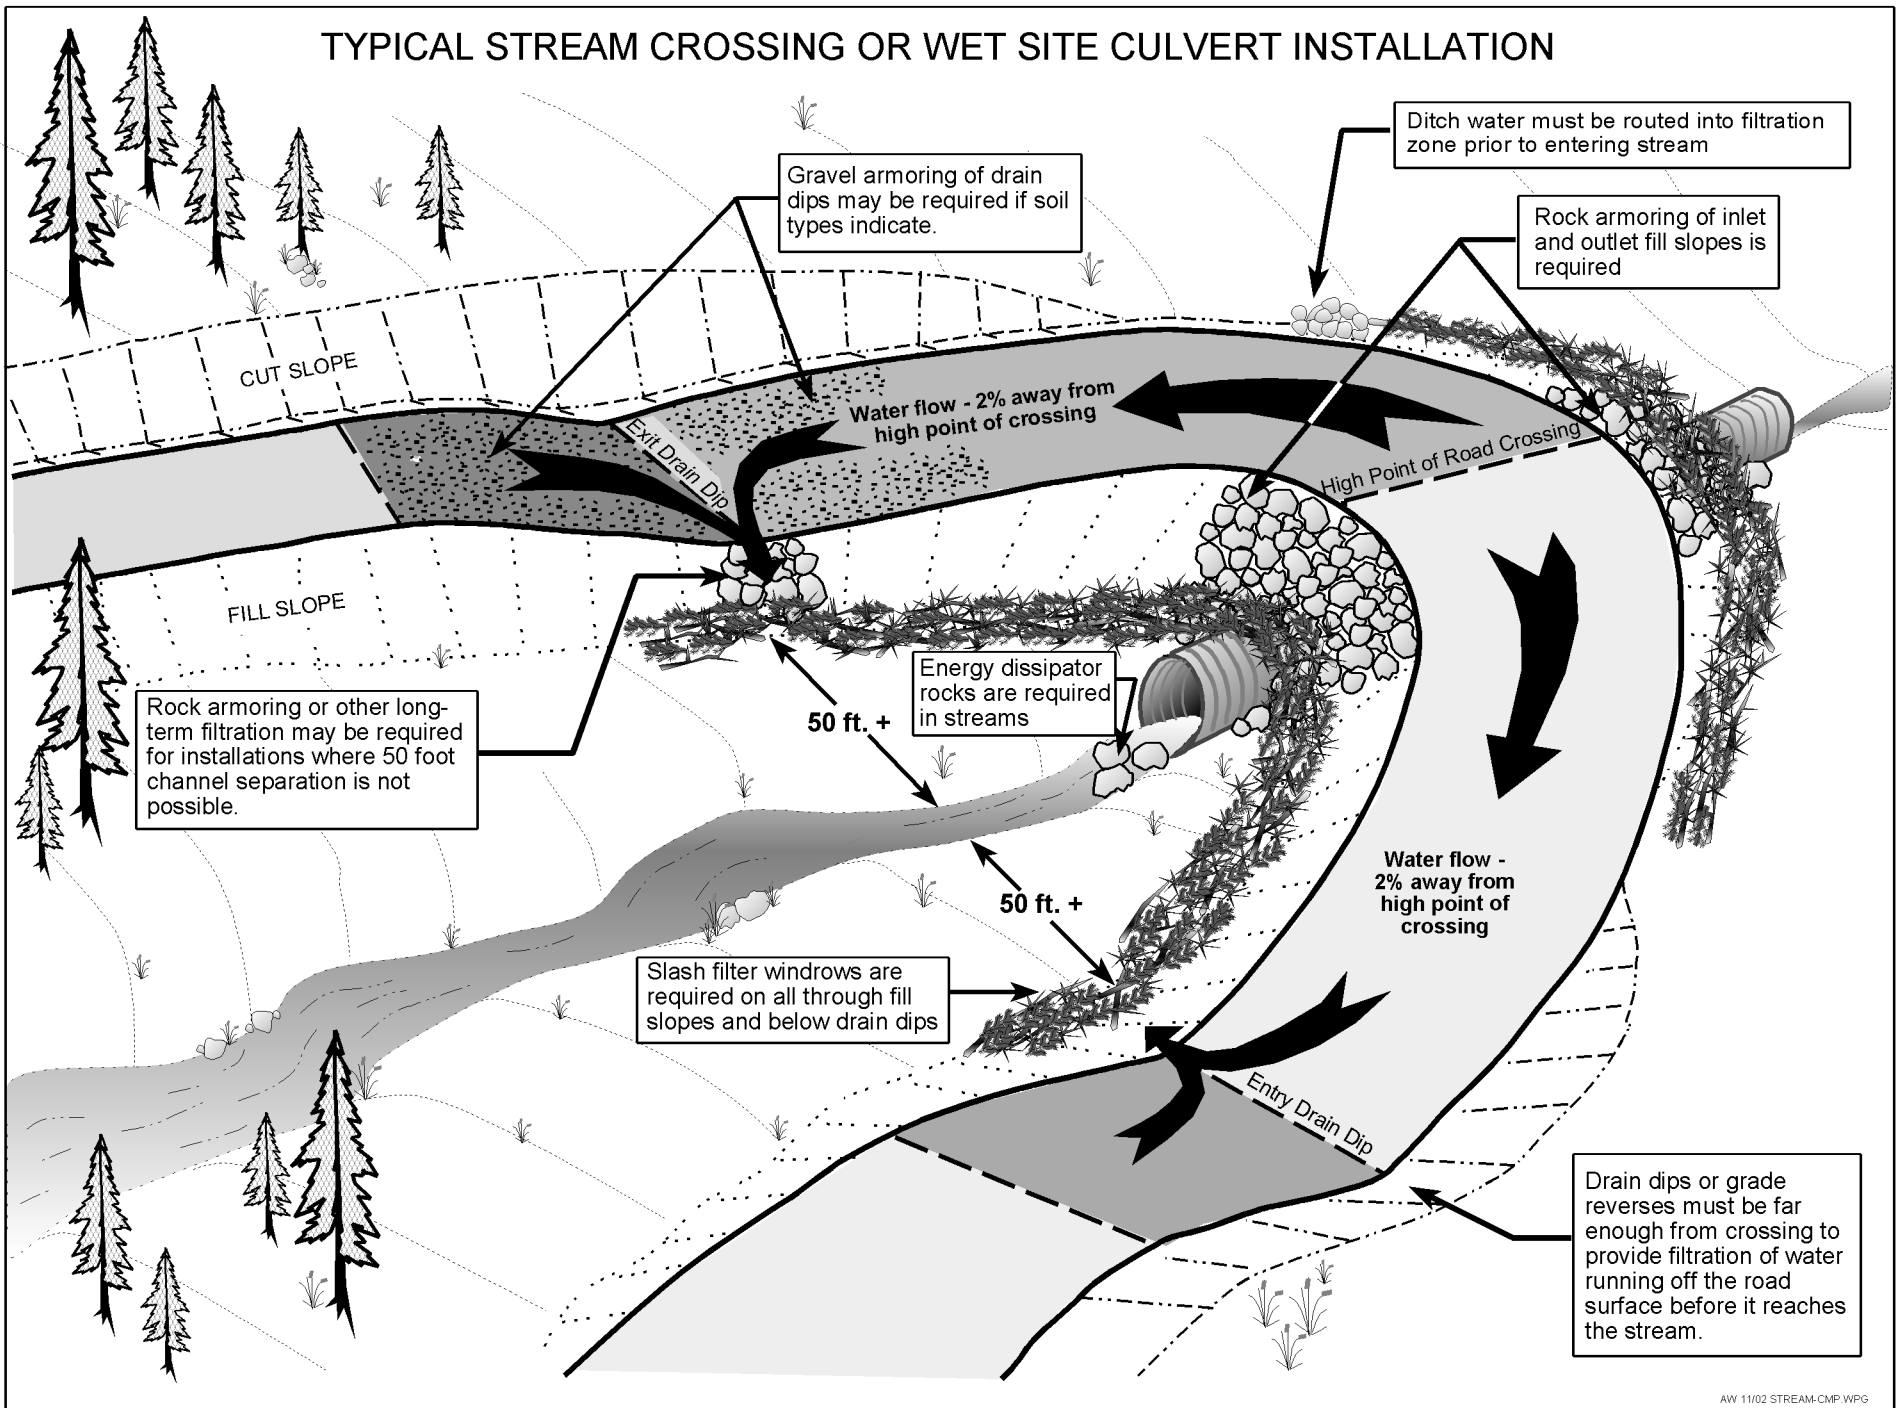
Typical Stream Crossing or Wet Site Culvert Installation.
